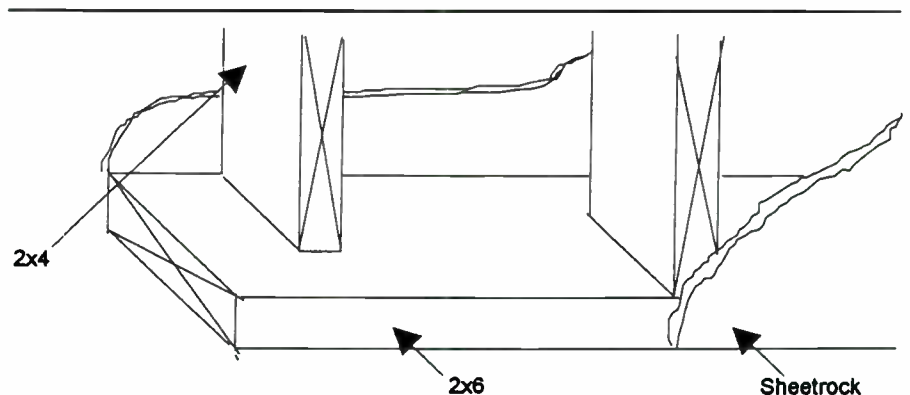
South wall construction for better sound isolation; STC 42-52dB with insulation.
